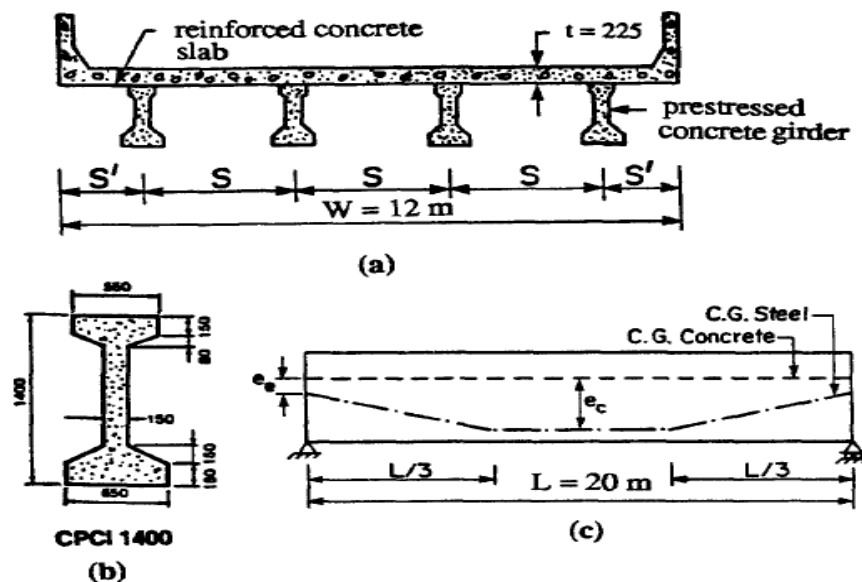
Case study considered by Lounis and Chon, (1993) : (a) Bridge cross section; (b) Girder cross section; (c) Tendon Layout.
